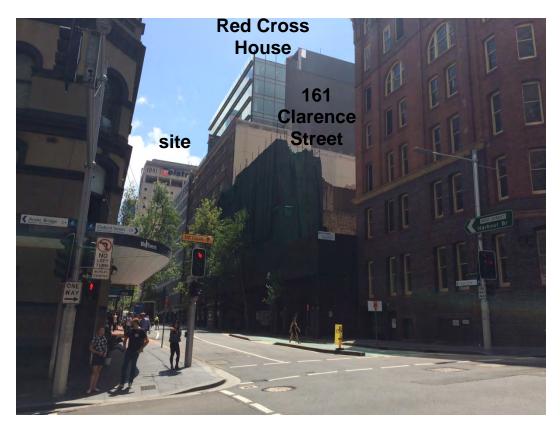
161 Clarence Street redevelopment, Red Cross House and Kent Street context as viewed in a northerly direction along Kent Street.
